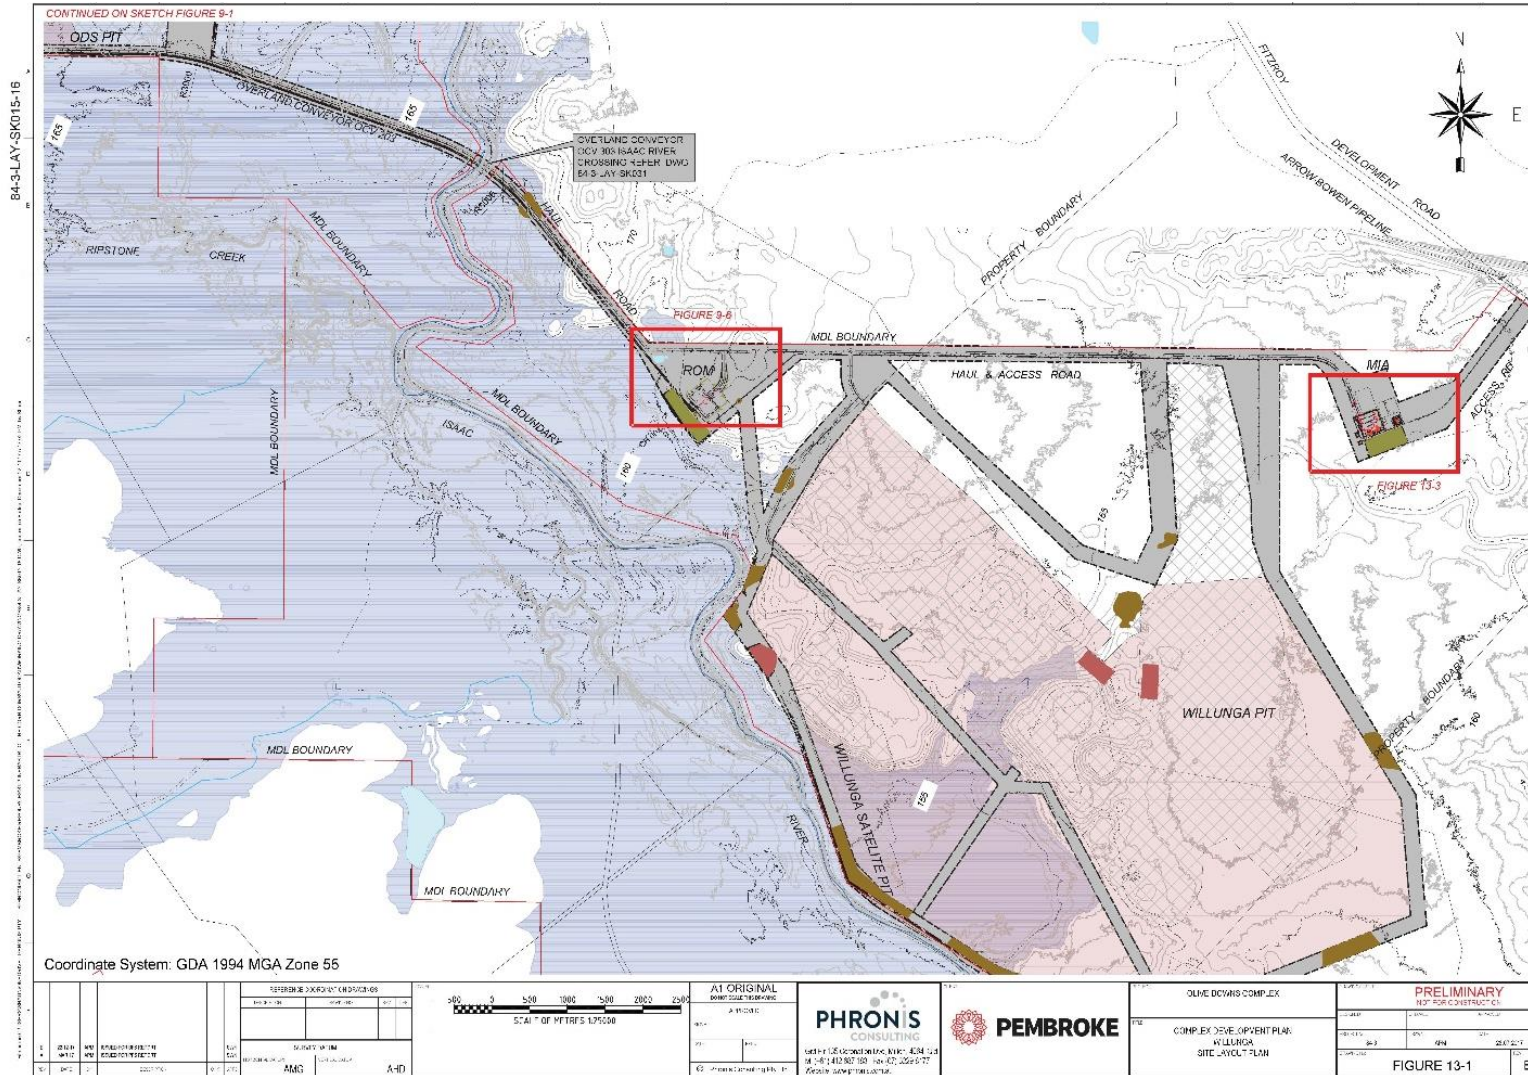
Complex Development Plan – Willunga – Site Layout Plan
